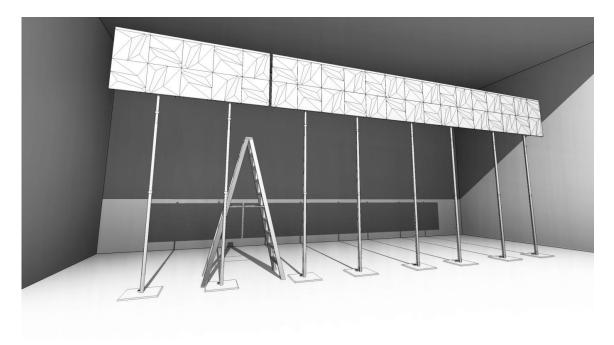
Position a 4.5 metre ladder or scissor lift behind the wall, between the first gap in the 3m sections.
